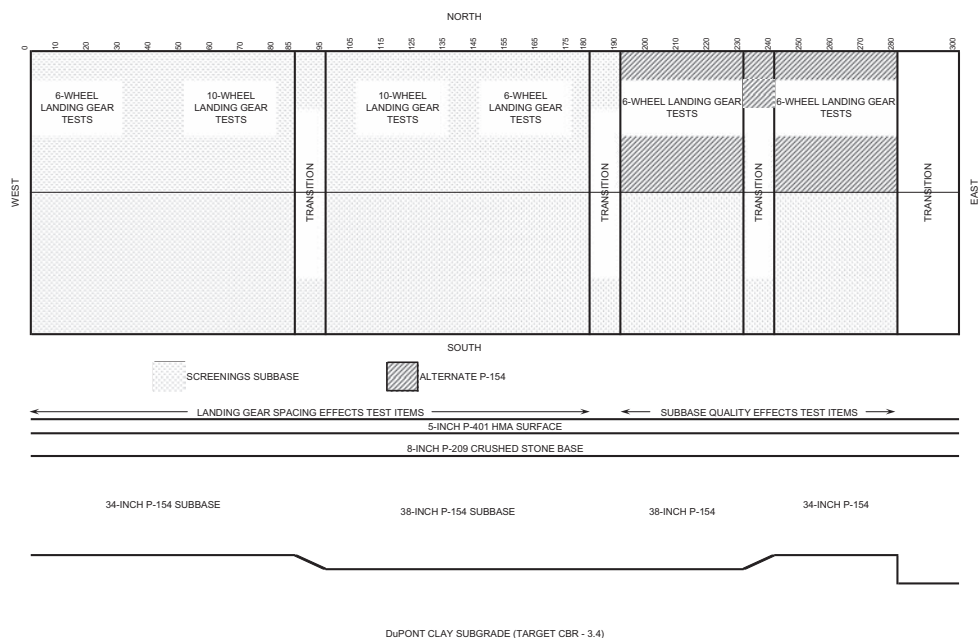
CC5 test item layout (1 inch = 25.4 mm).
